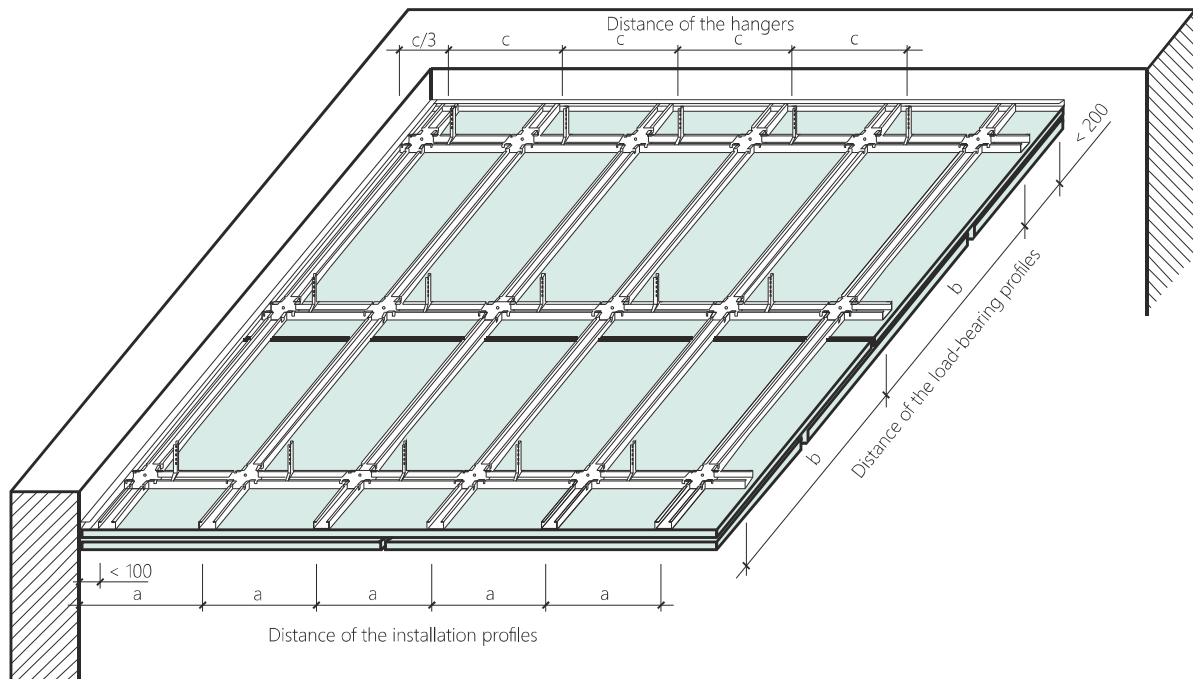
Schematic drawing of the load-bearing construction of the ceiling for cladding with CETRIS® cement bonded particleboard (thickness 2 × 12 mm)
